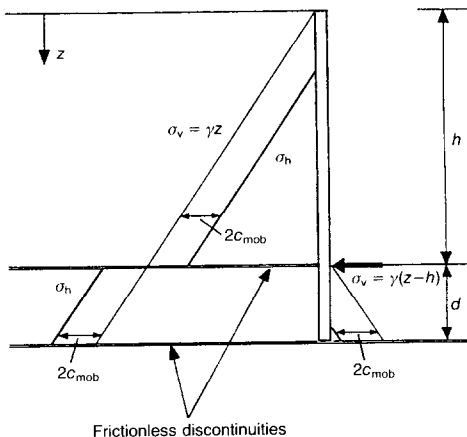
Equilibrium stress field for wall propped at excavation base: undrained soil
